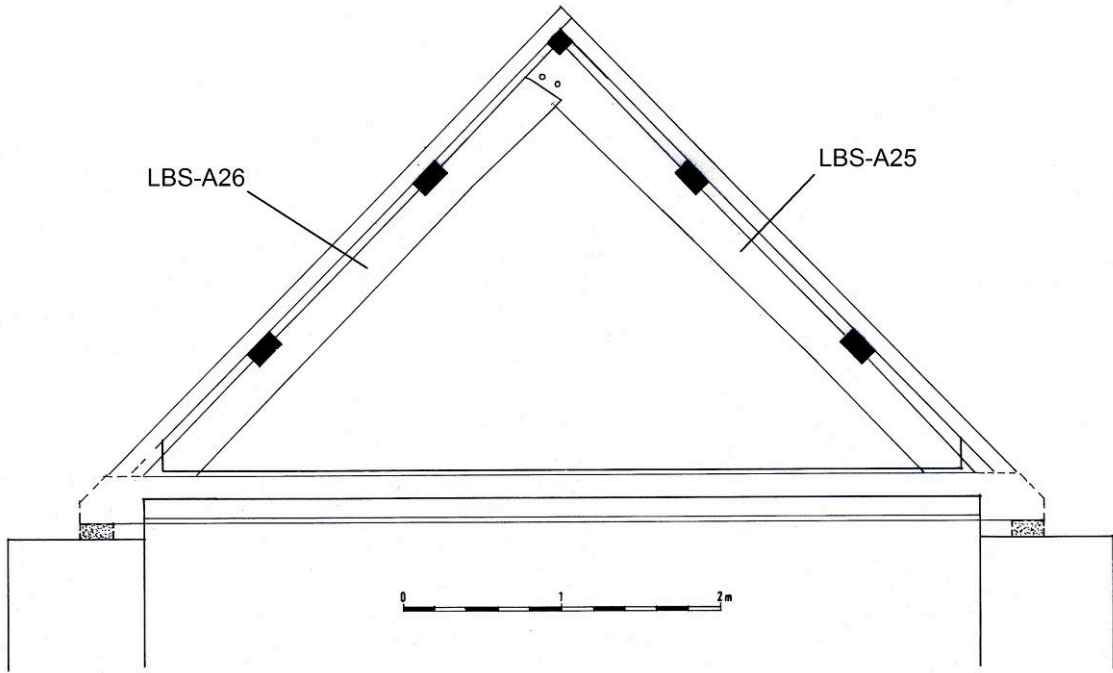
Central hall/parlour range; truss 1 (east face), showing the location of samples LBS-A25 and LBS-A26 (Martin Roberts)
